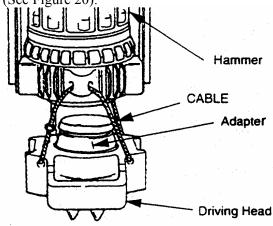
Installing Cable and Clamps through Driving Head, Adapter, and Hammer.
